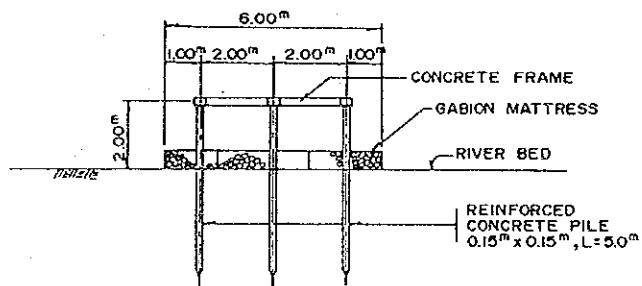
STANDARD DESIGN SECTION OF REVETMENT
